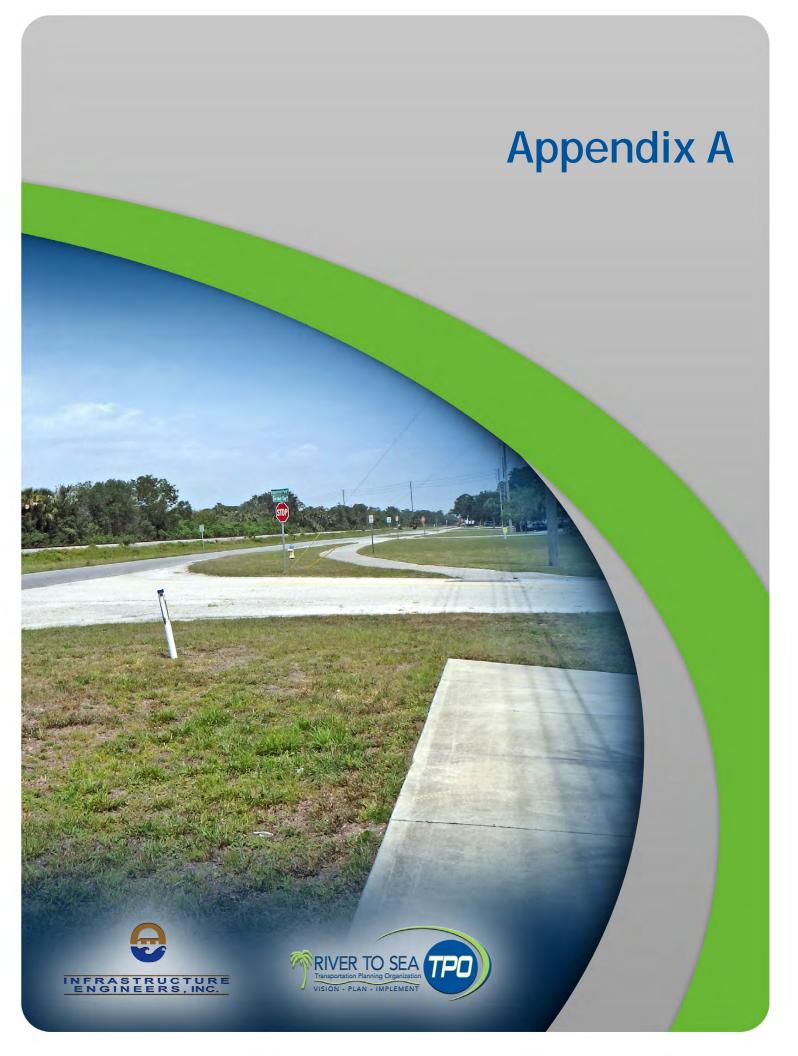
Looking west down Turnbull Bay Rd. at Industrial Park Ave.
